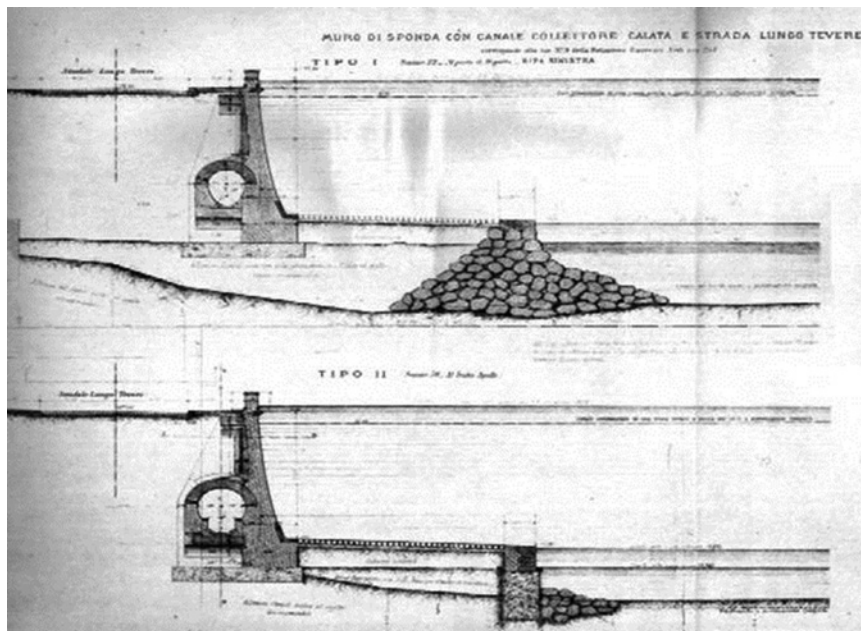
Section of the walls with sewer (Canevari, 1875).
